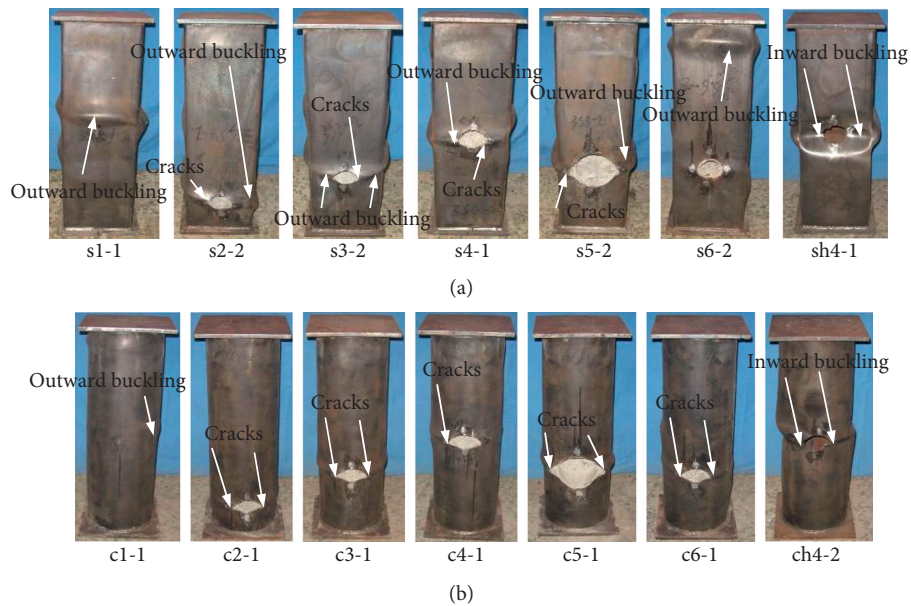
Typical failure modes of opening CFST columns. (a) Square section. (b) Circular section.
